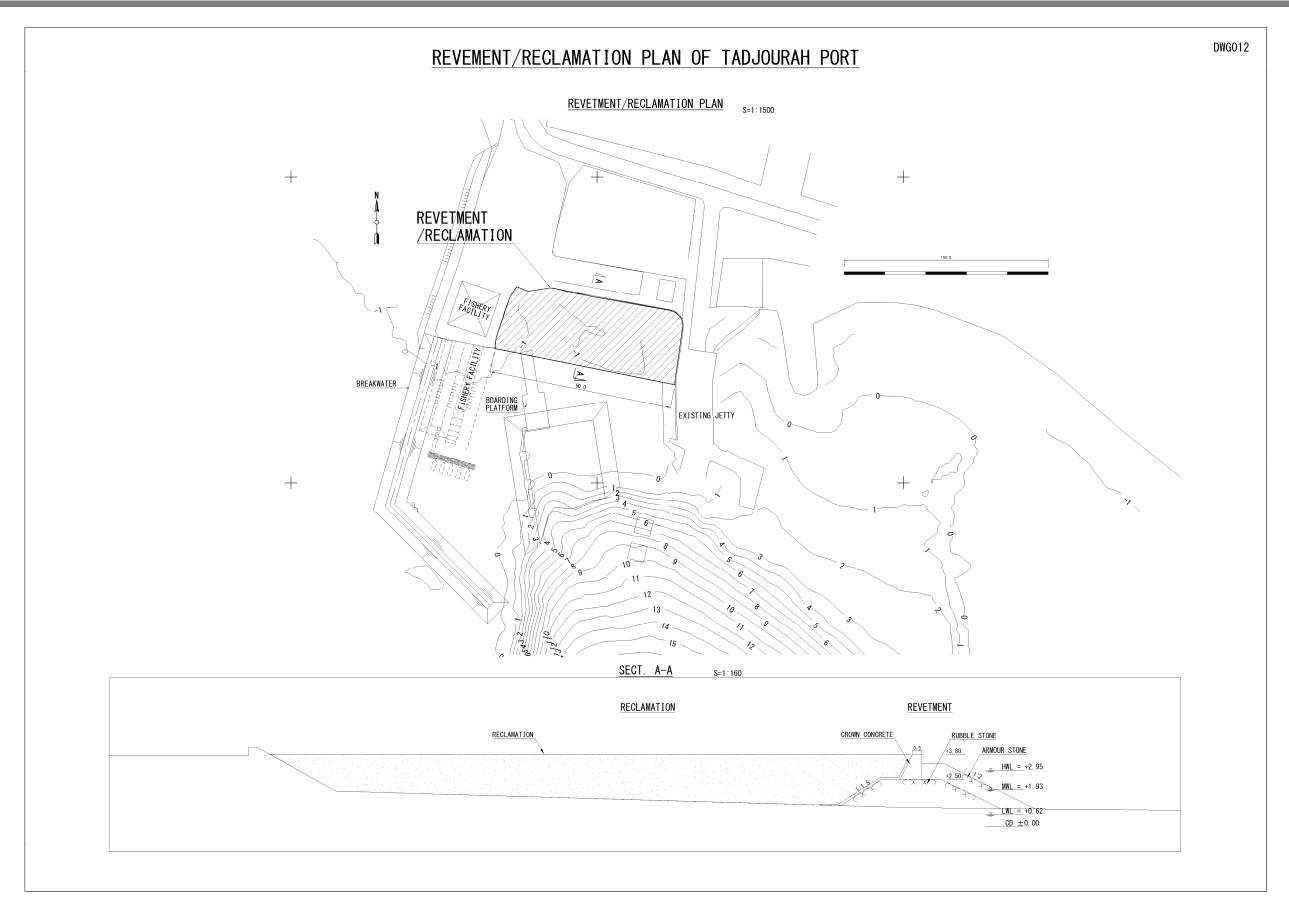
Revetment / Reclamation Plan of Tadjourah Port
